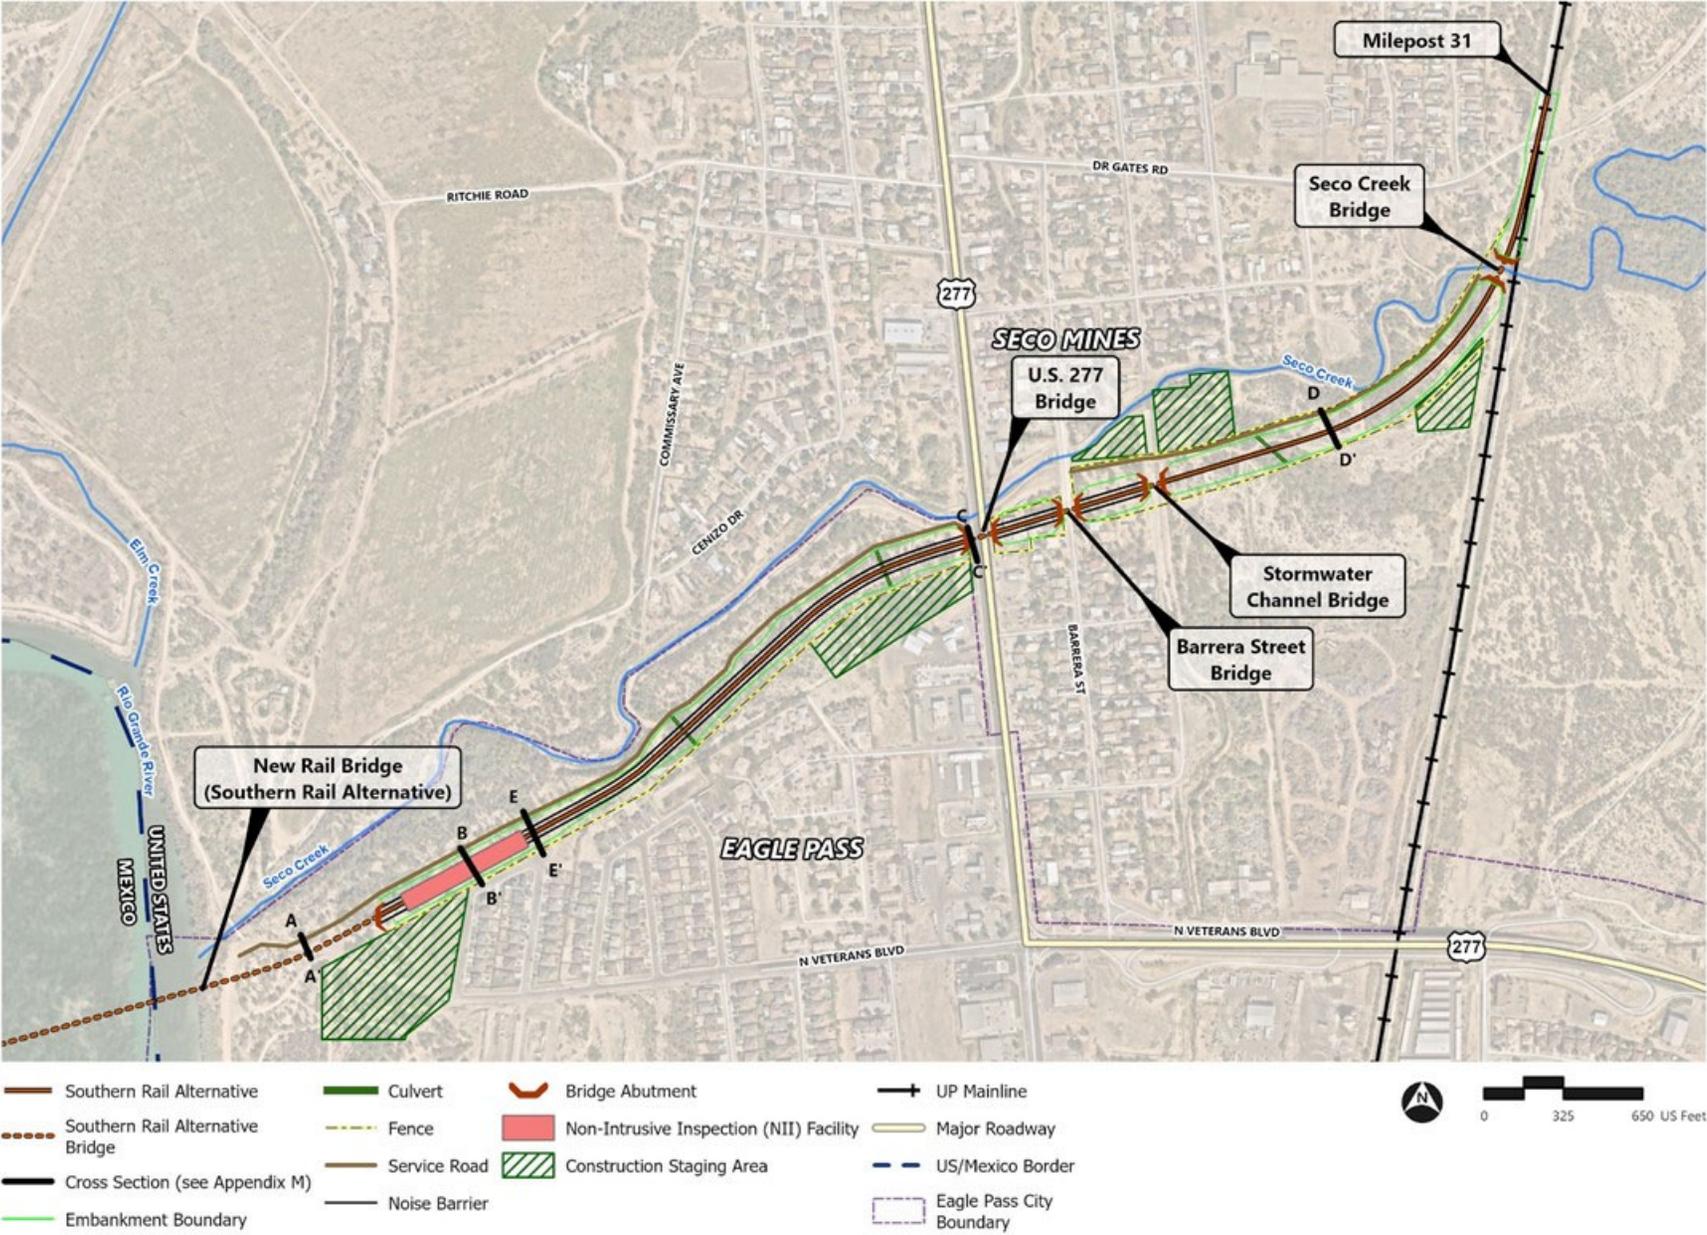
New Rail Bridge (Southern Rail Alternative) and New Road Bridge Construction
